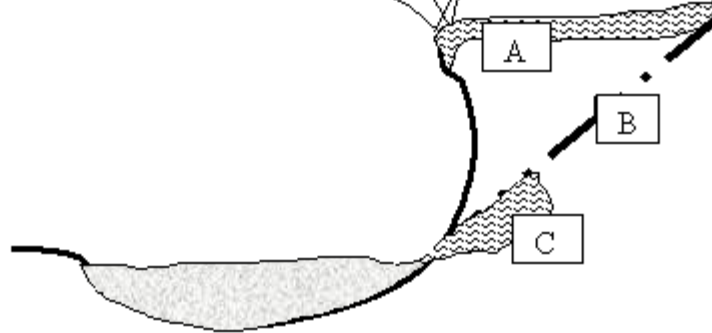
Conceptual approach to stabilizing steep eroding stream banks.
